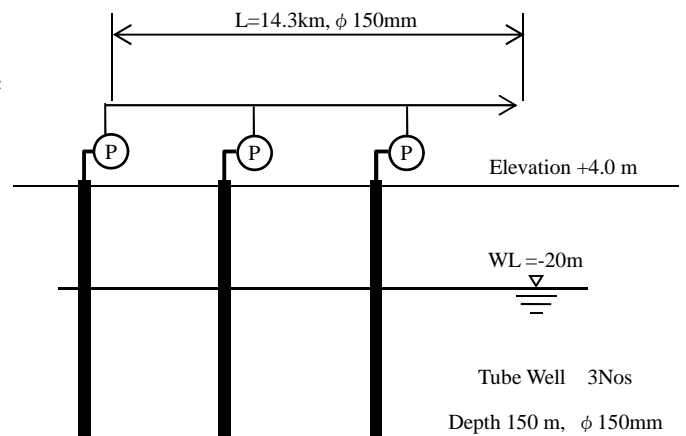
Layout Drawing of the Tube Wells on East Plain
